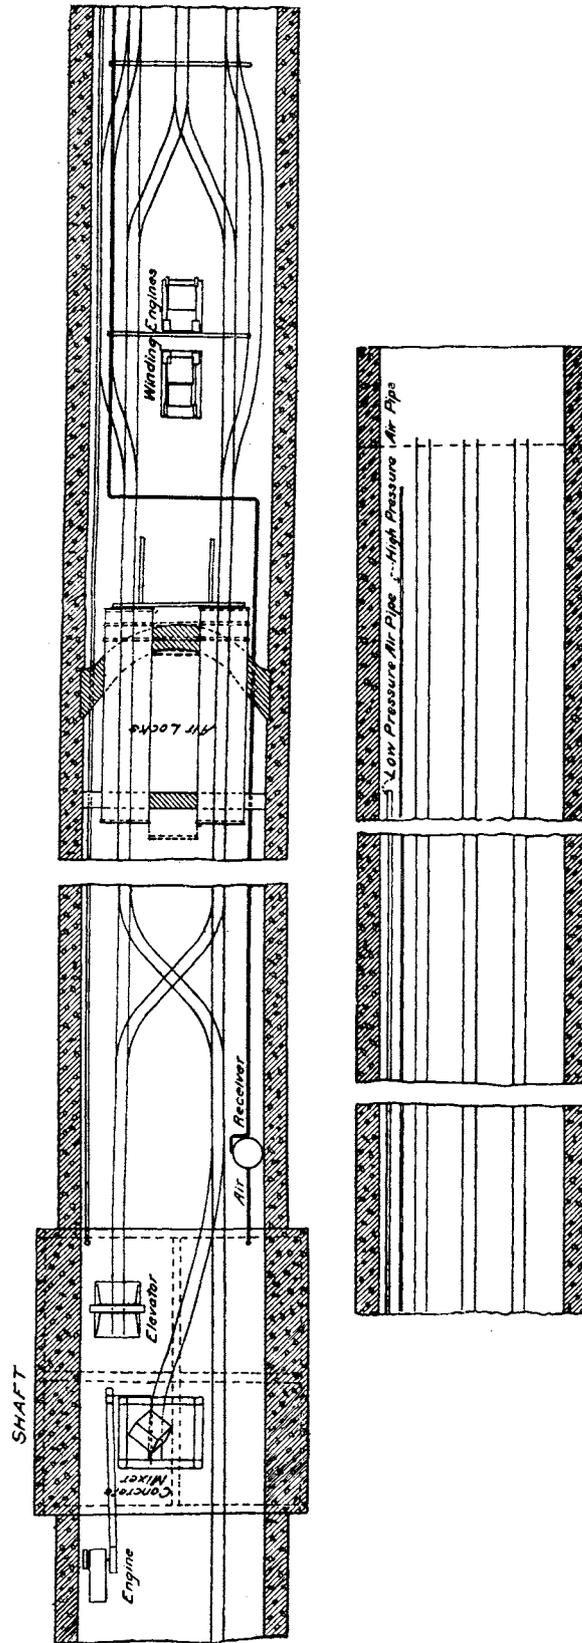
UNDERGROUND RAILWAY, BOSTON, U.S.A.
